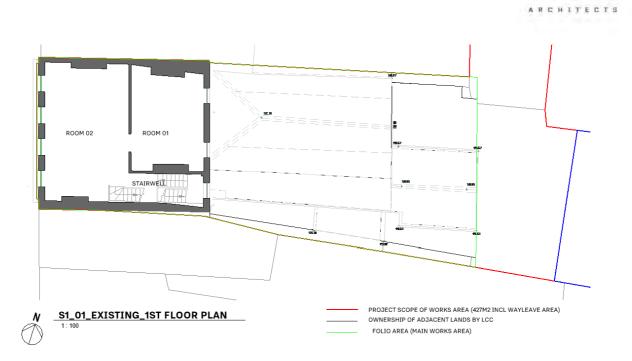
Existing Survey at First Floor level -refer to Appendix H
